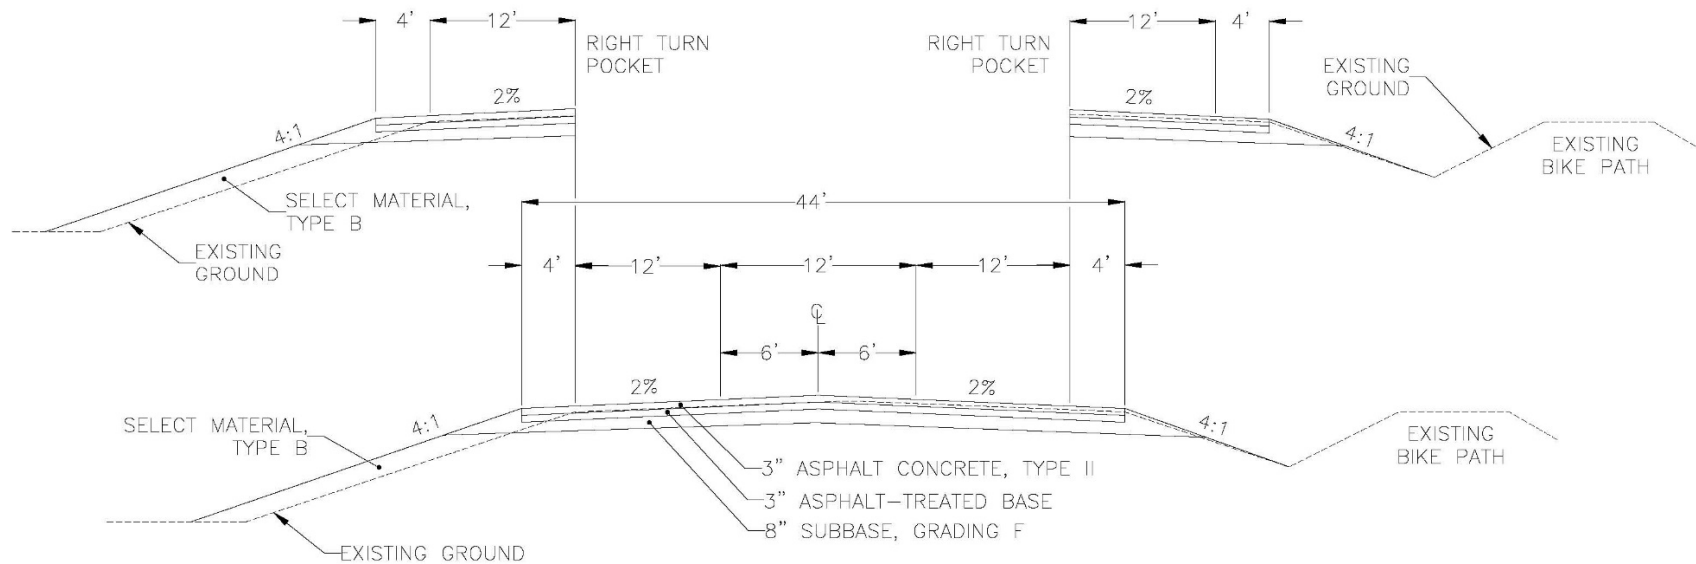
Badger Road Two Way Left Turn Lane Typical Section
